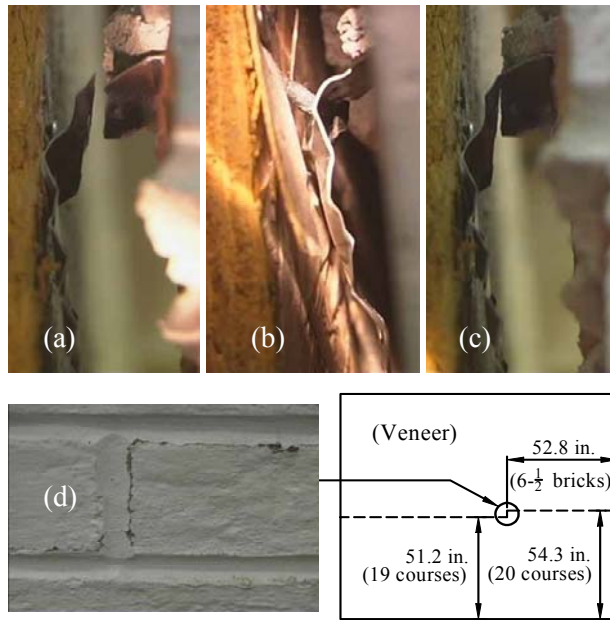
Veneer wall damage before collapse in both Walls-1 and -2: (a) tie fracture and (b) nail pullout. In Wall-2 only: (c) partial tie fracture and (d) cracks in the brick veneer bed joints.
